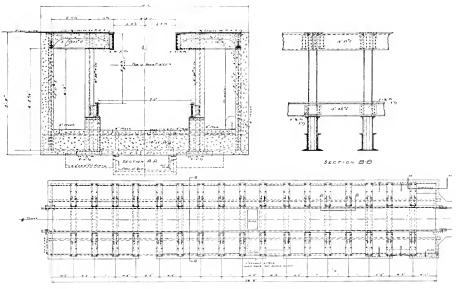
Plan and Sectional Views of Locomotive Weighing Pit
